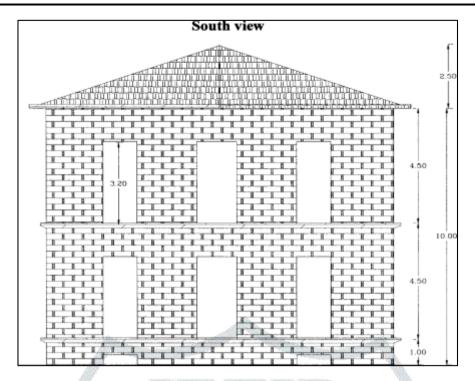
Side view of three-dimensional (3D) masonry building studied
